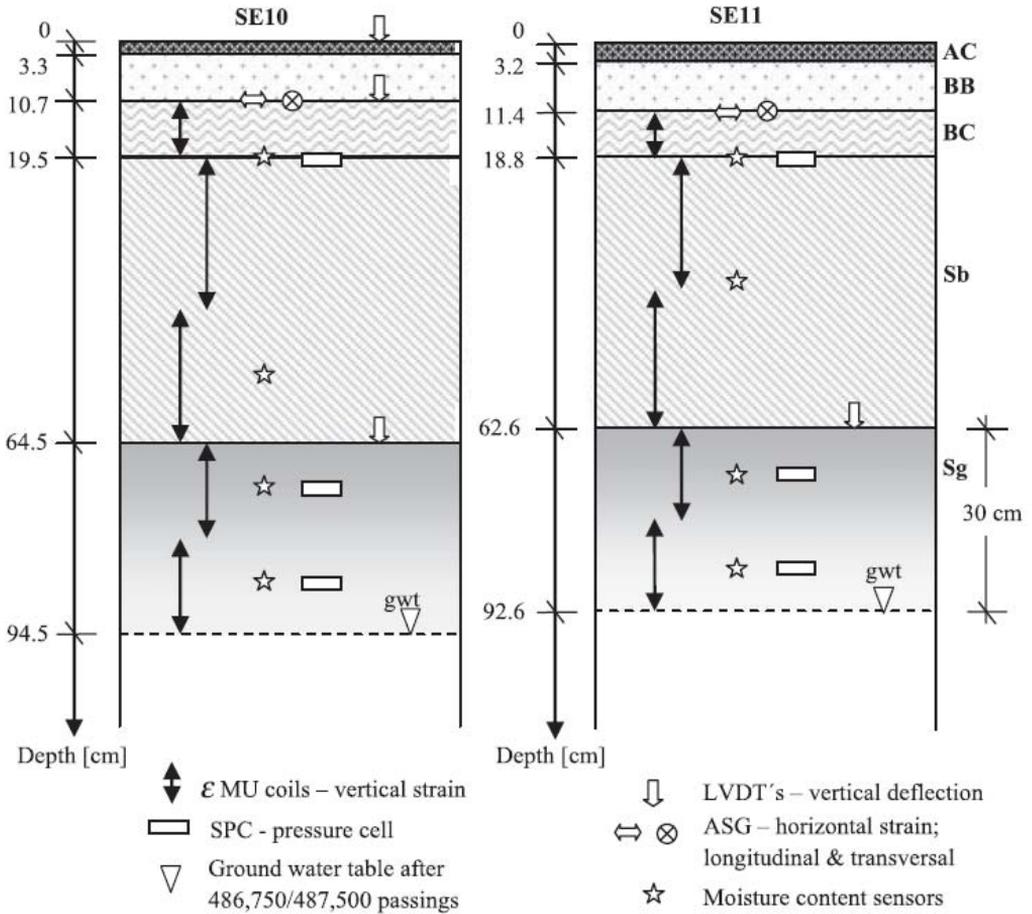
Cross-section of pavement structures SE10 and SE11 with mounted measuring equipment [3]
